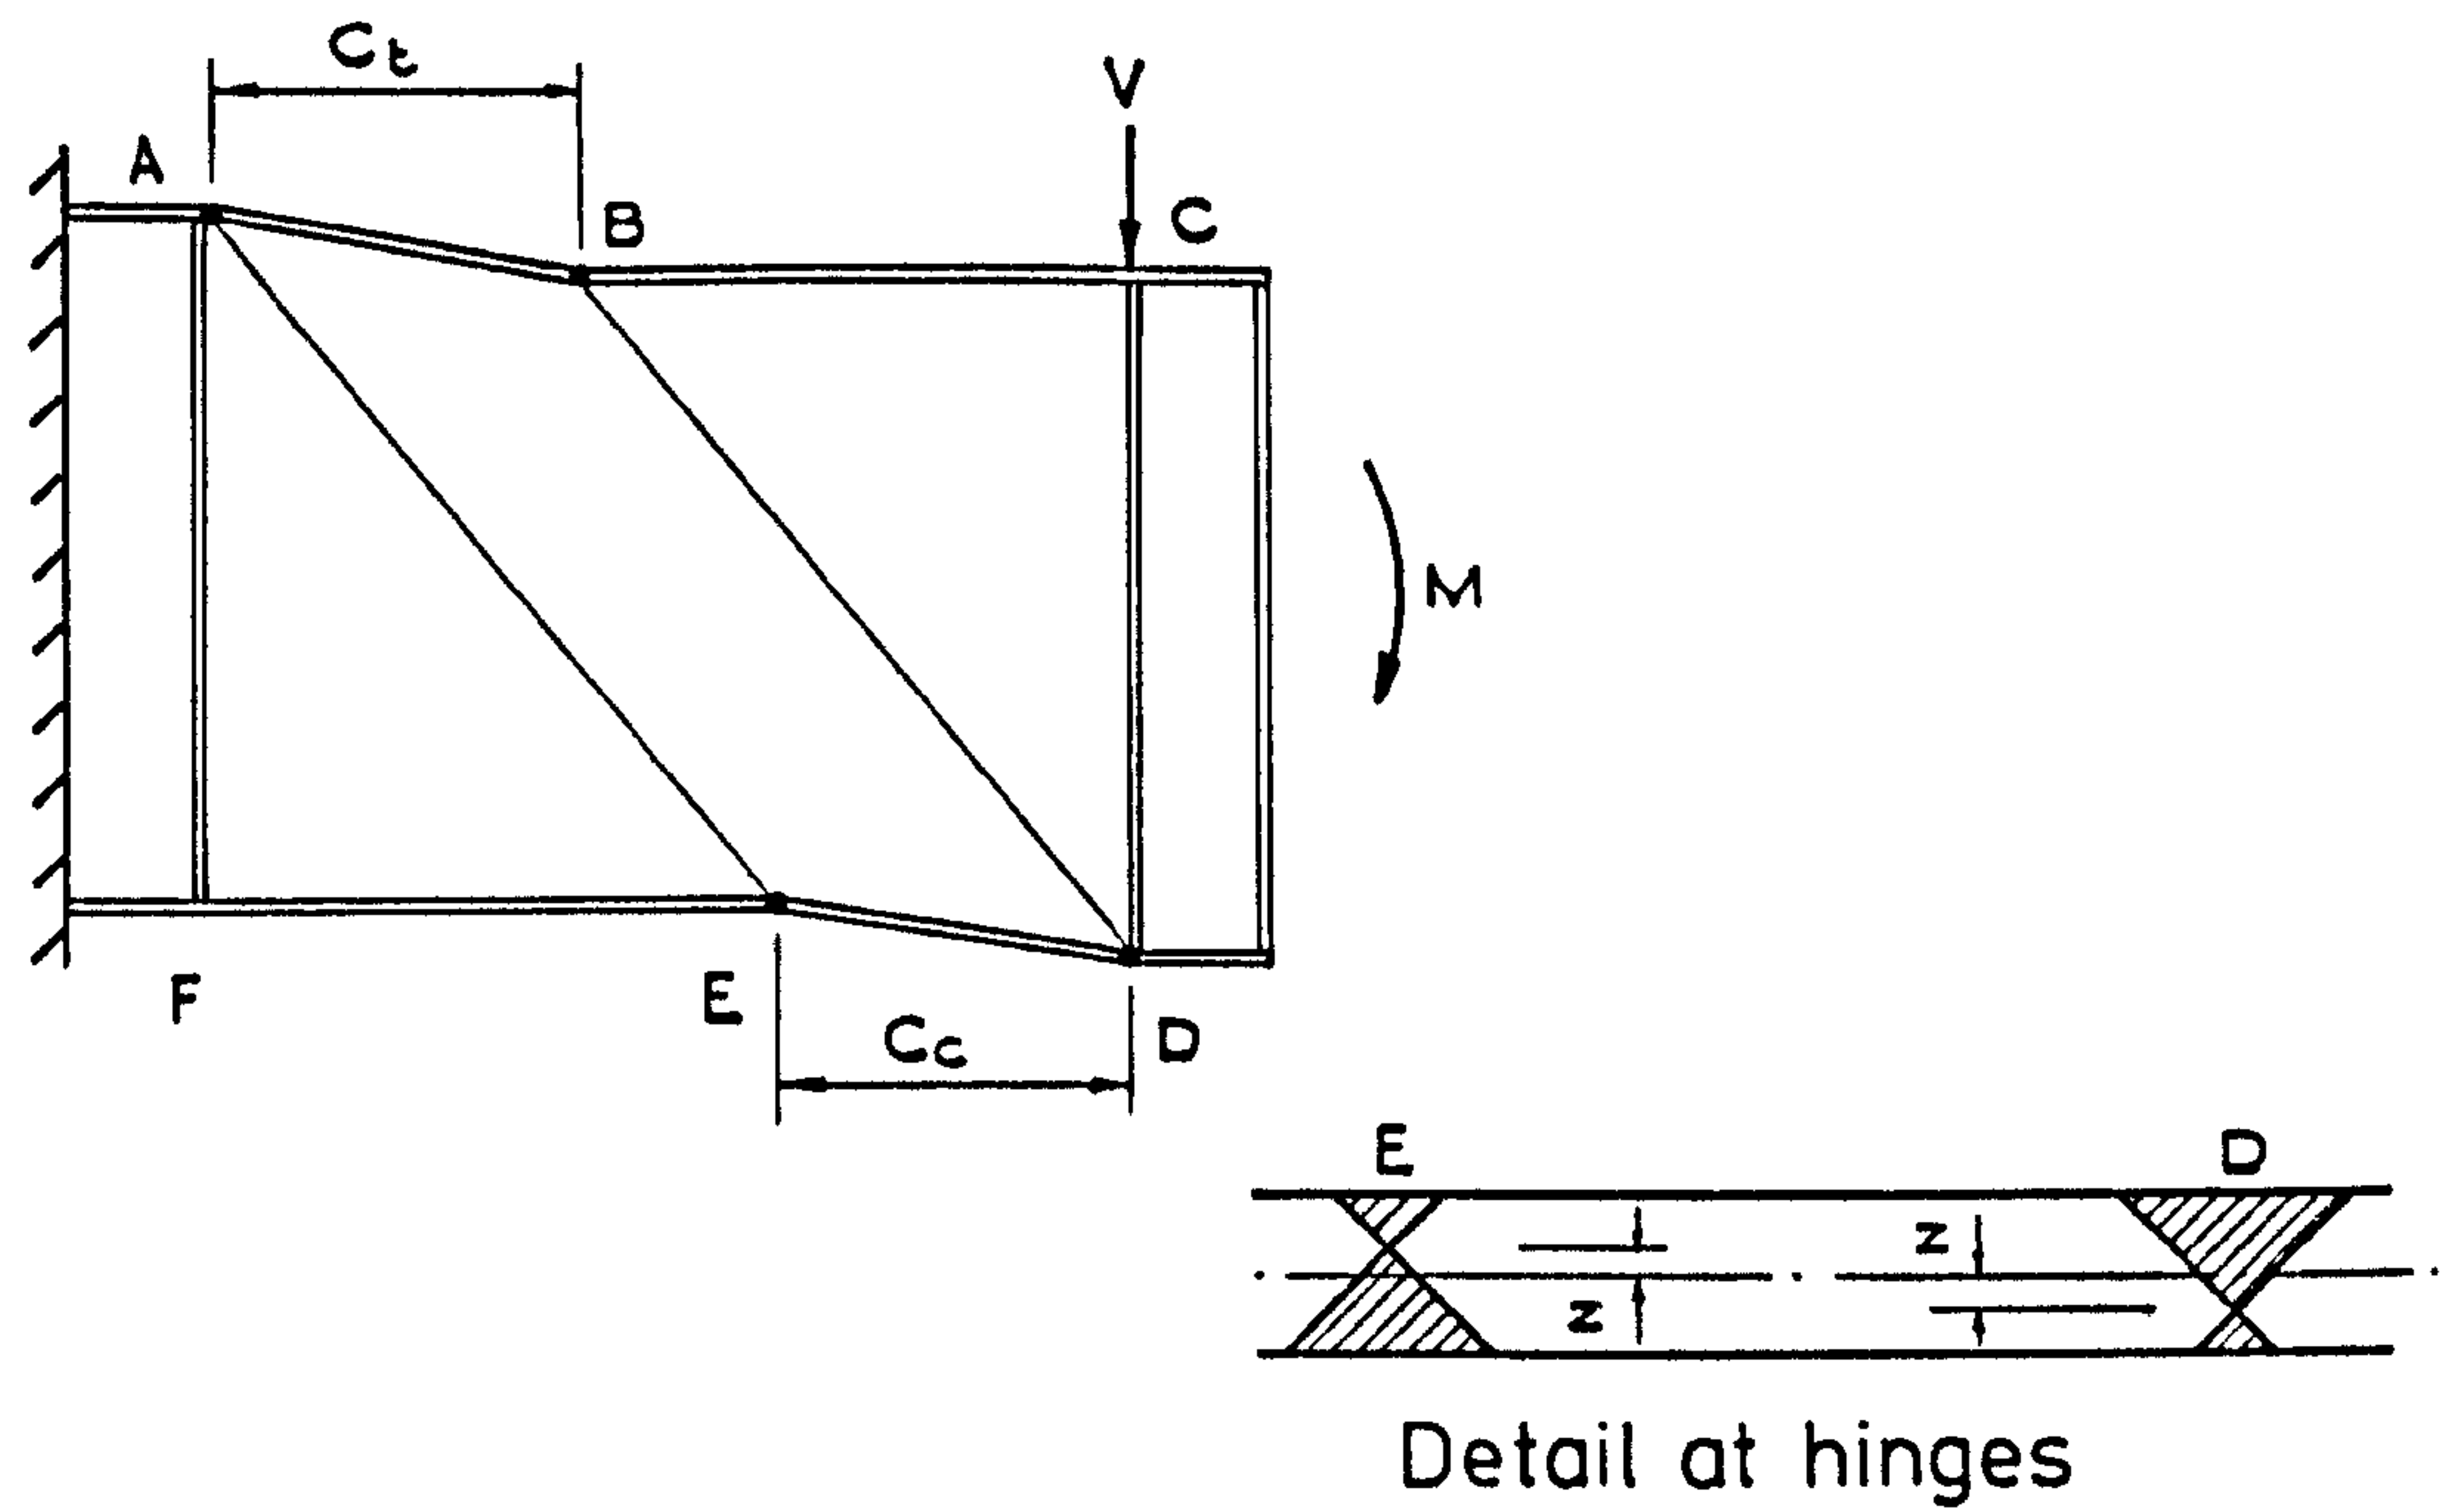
COLLAPSE MECHANISM FOR GIRDER SUBJECTED TO COMBINED LOADING
